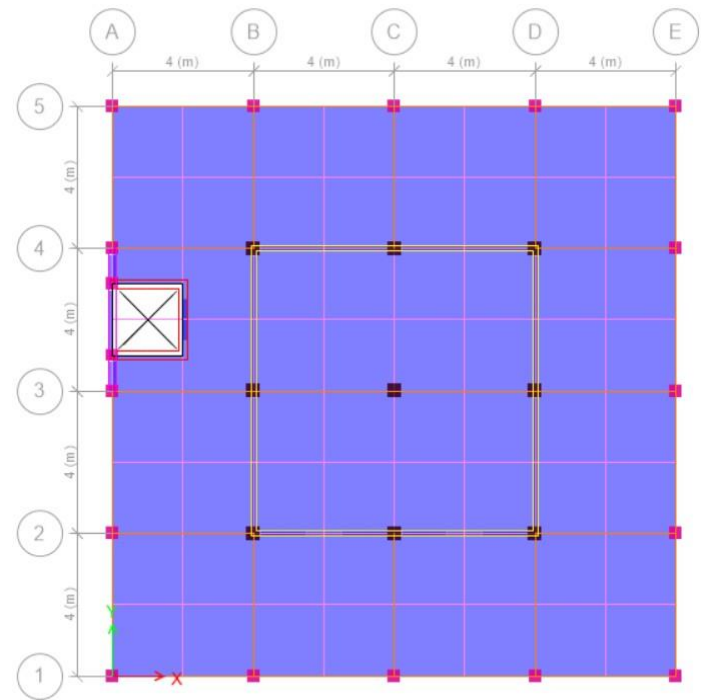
Plan view of RC frame structure with shear wall in box shape at centre (with opening)
